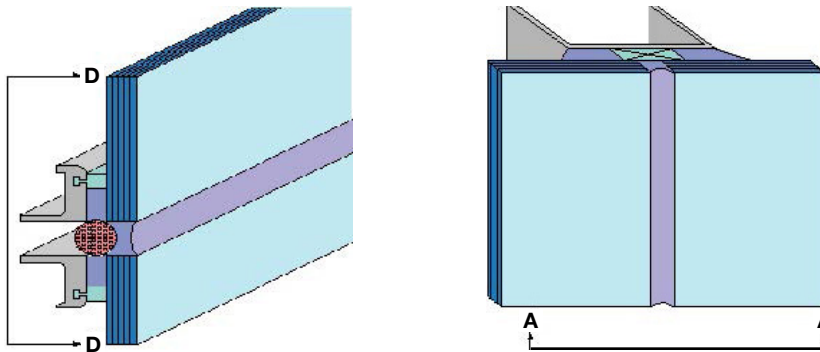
Typical Four (4) sided structural glazing transom and mullion details.
